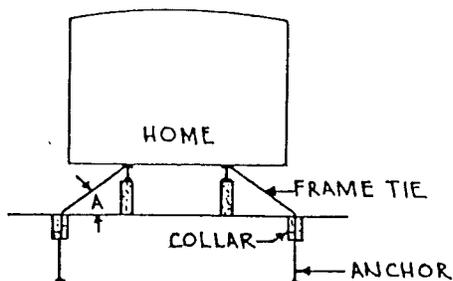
Frame ties extend diagonally downward from I-beams to anchors.
